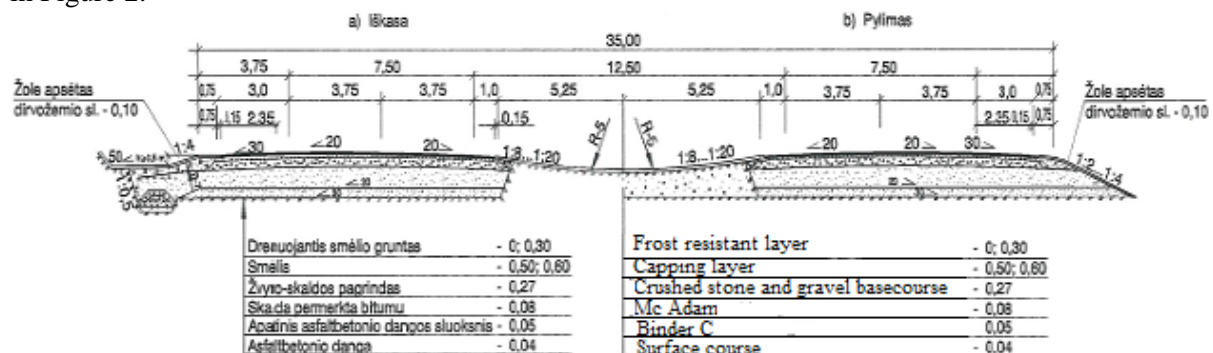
The existing structure of the road A1 Vilnius–Kaunas–Klaipeda.
